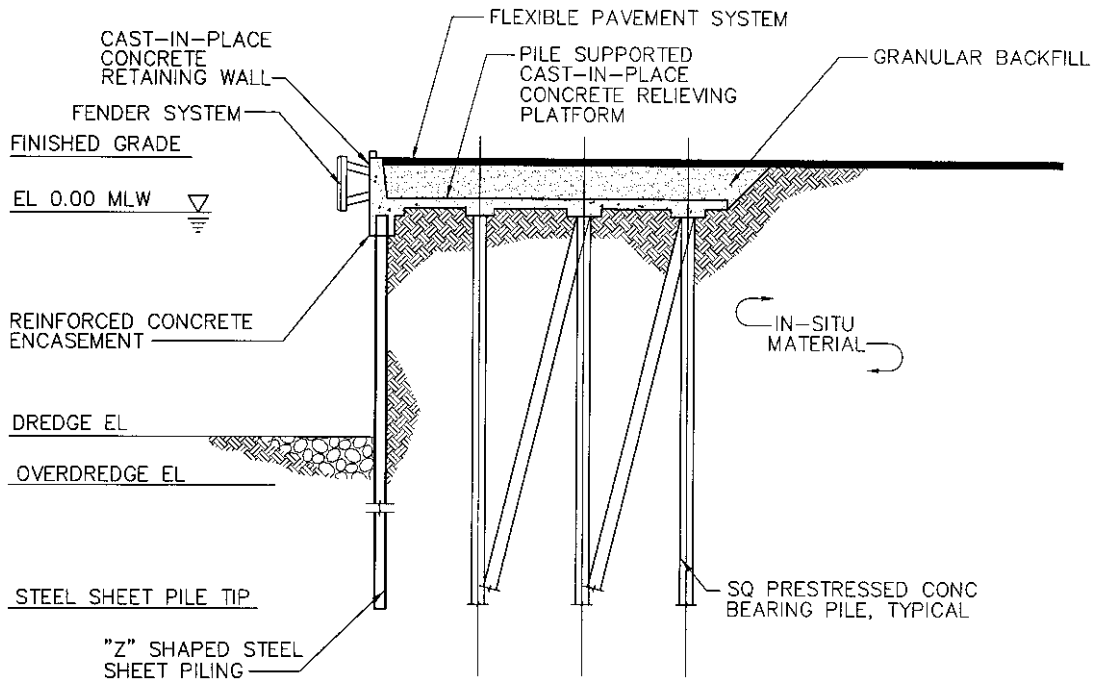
Sheet pile bulkhead with relieving platform.
